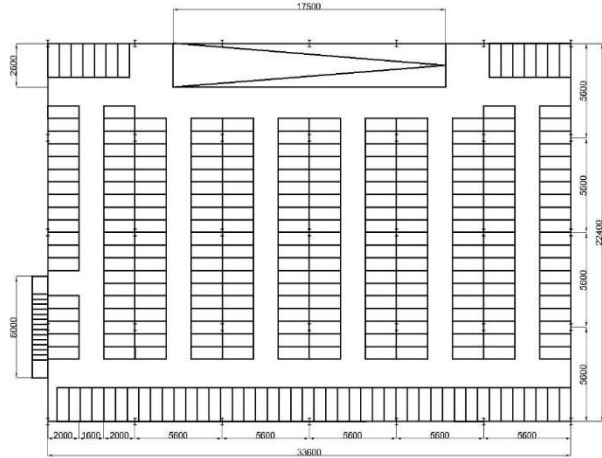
Design Layout of Floors 2 and 3 at Location Plan B
